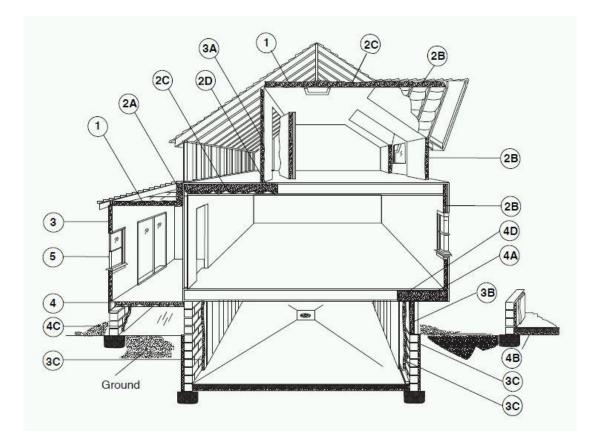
Insulation locations on the building envelope. 1 – unfinished attic spaces, 2 – finished attic rooms, 3 – exterior walls, 4 – floors above cold spaces, 5 caulk and seal windows and doors.
